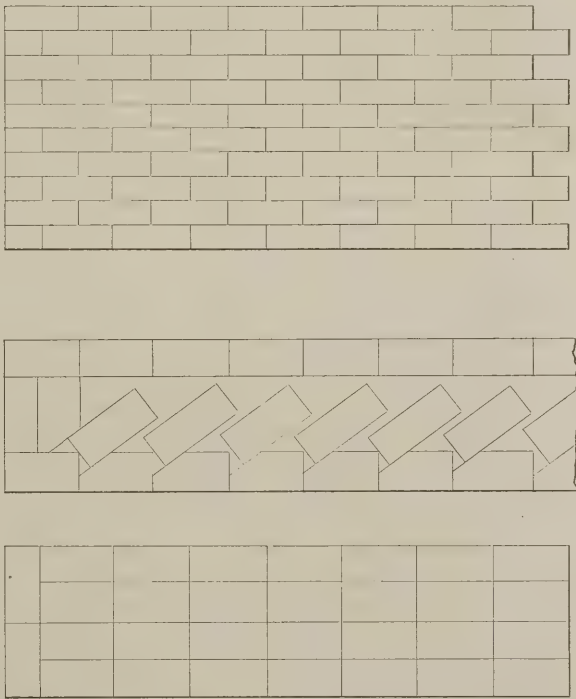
Elevation and Plans of an External Wall in Running Bond.
